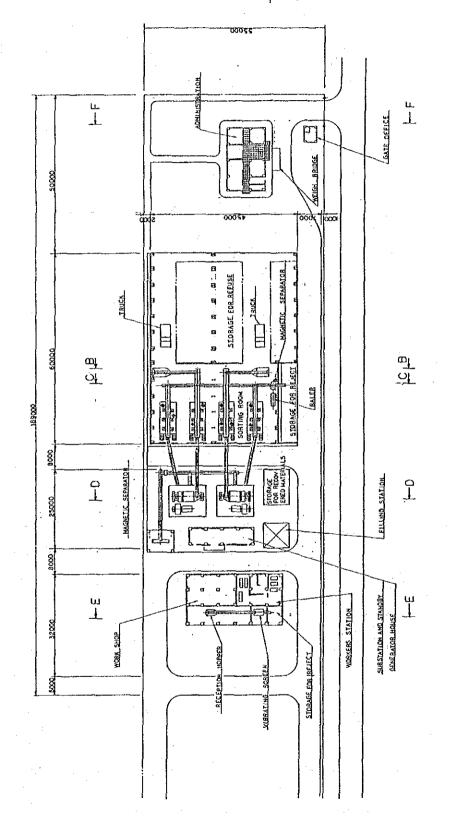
LAYOUT OF NEW ABIS COMPOST PLANT
